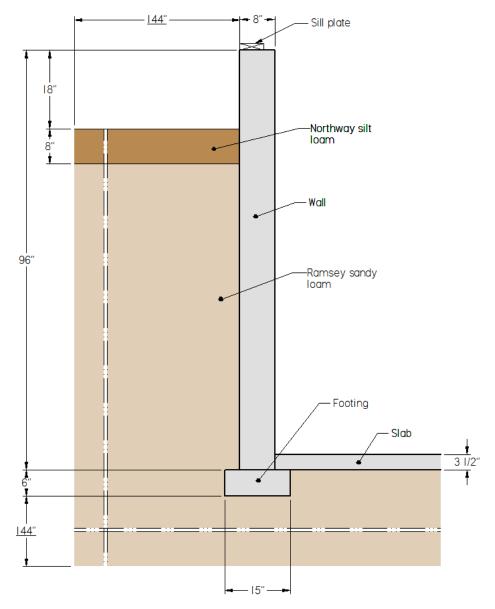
Retrofit full basement foundation vertical section (without insulation)
